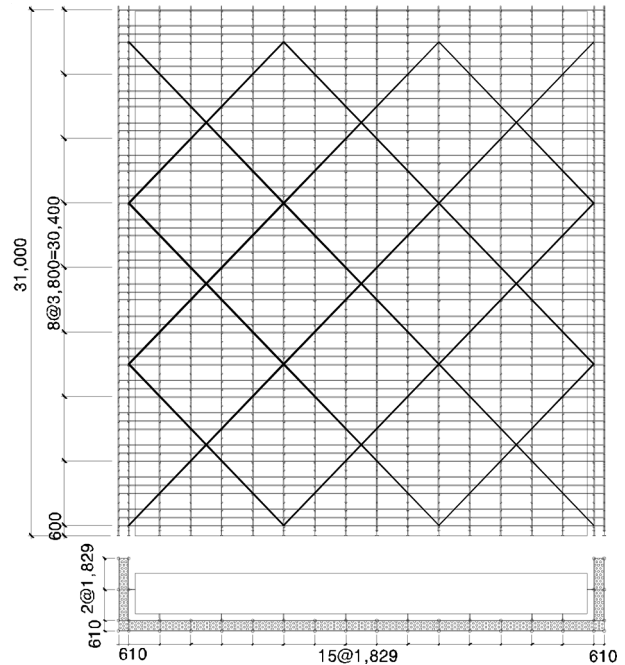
Standard drawing for system scaffold(H=31.0 m).
